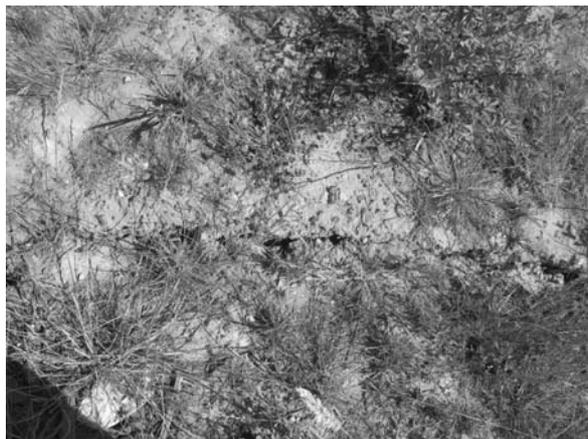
Fissure in soil at place adjacent to roadway A4 from North (Wirek parking place)
